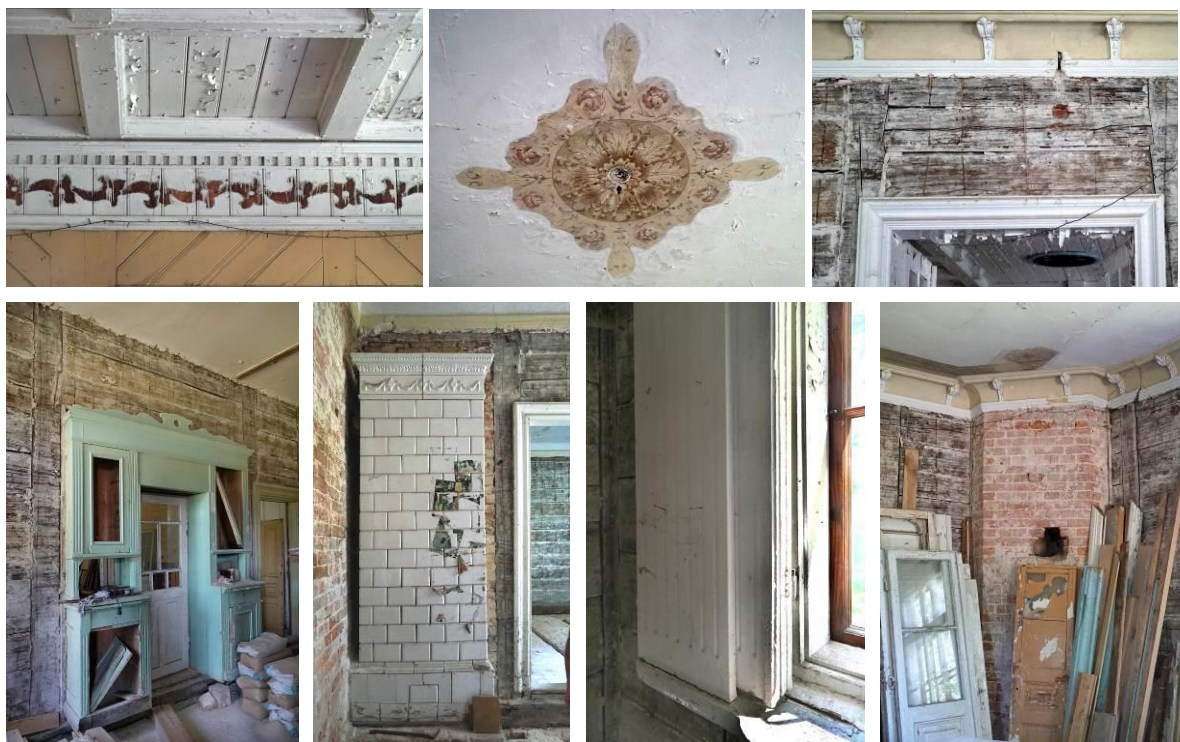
Manor house in Rzuców, preserved elements of interior design and decoration – decoration of the ceilings above the ground floor, sideboard built into a wooden wall with a pass-through door, original tiled ceramic stove, original wooden internal shutter, corner brick fireplace. Source: original photo 2023
